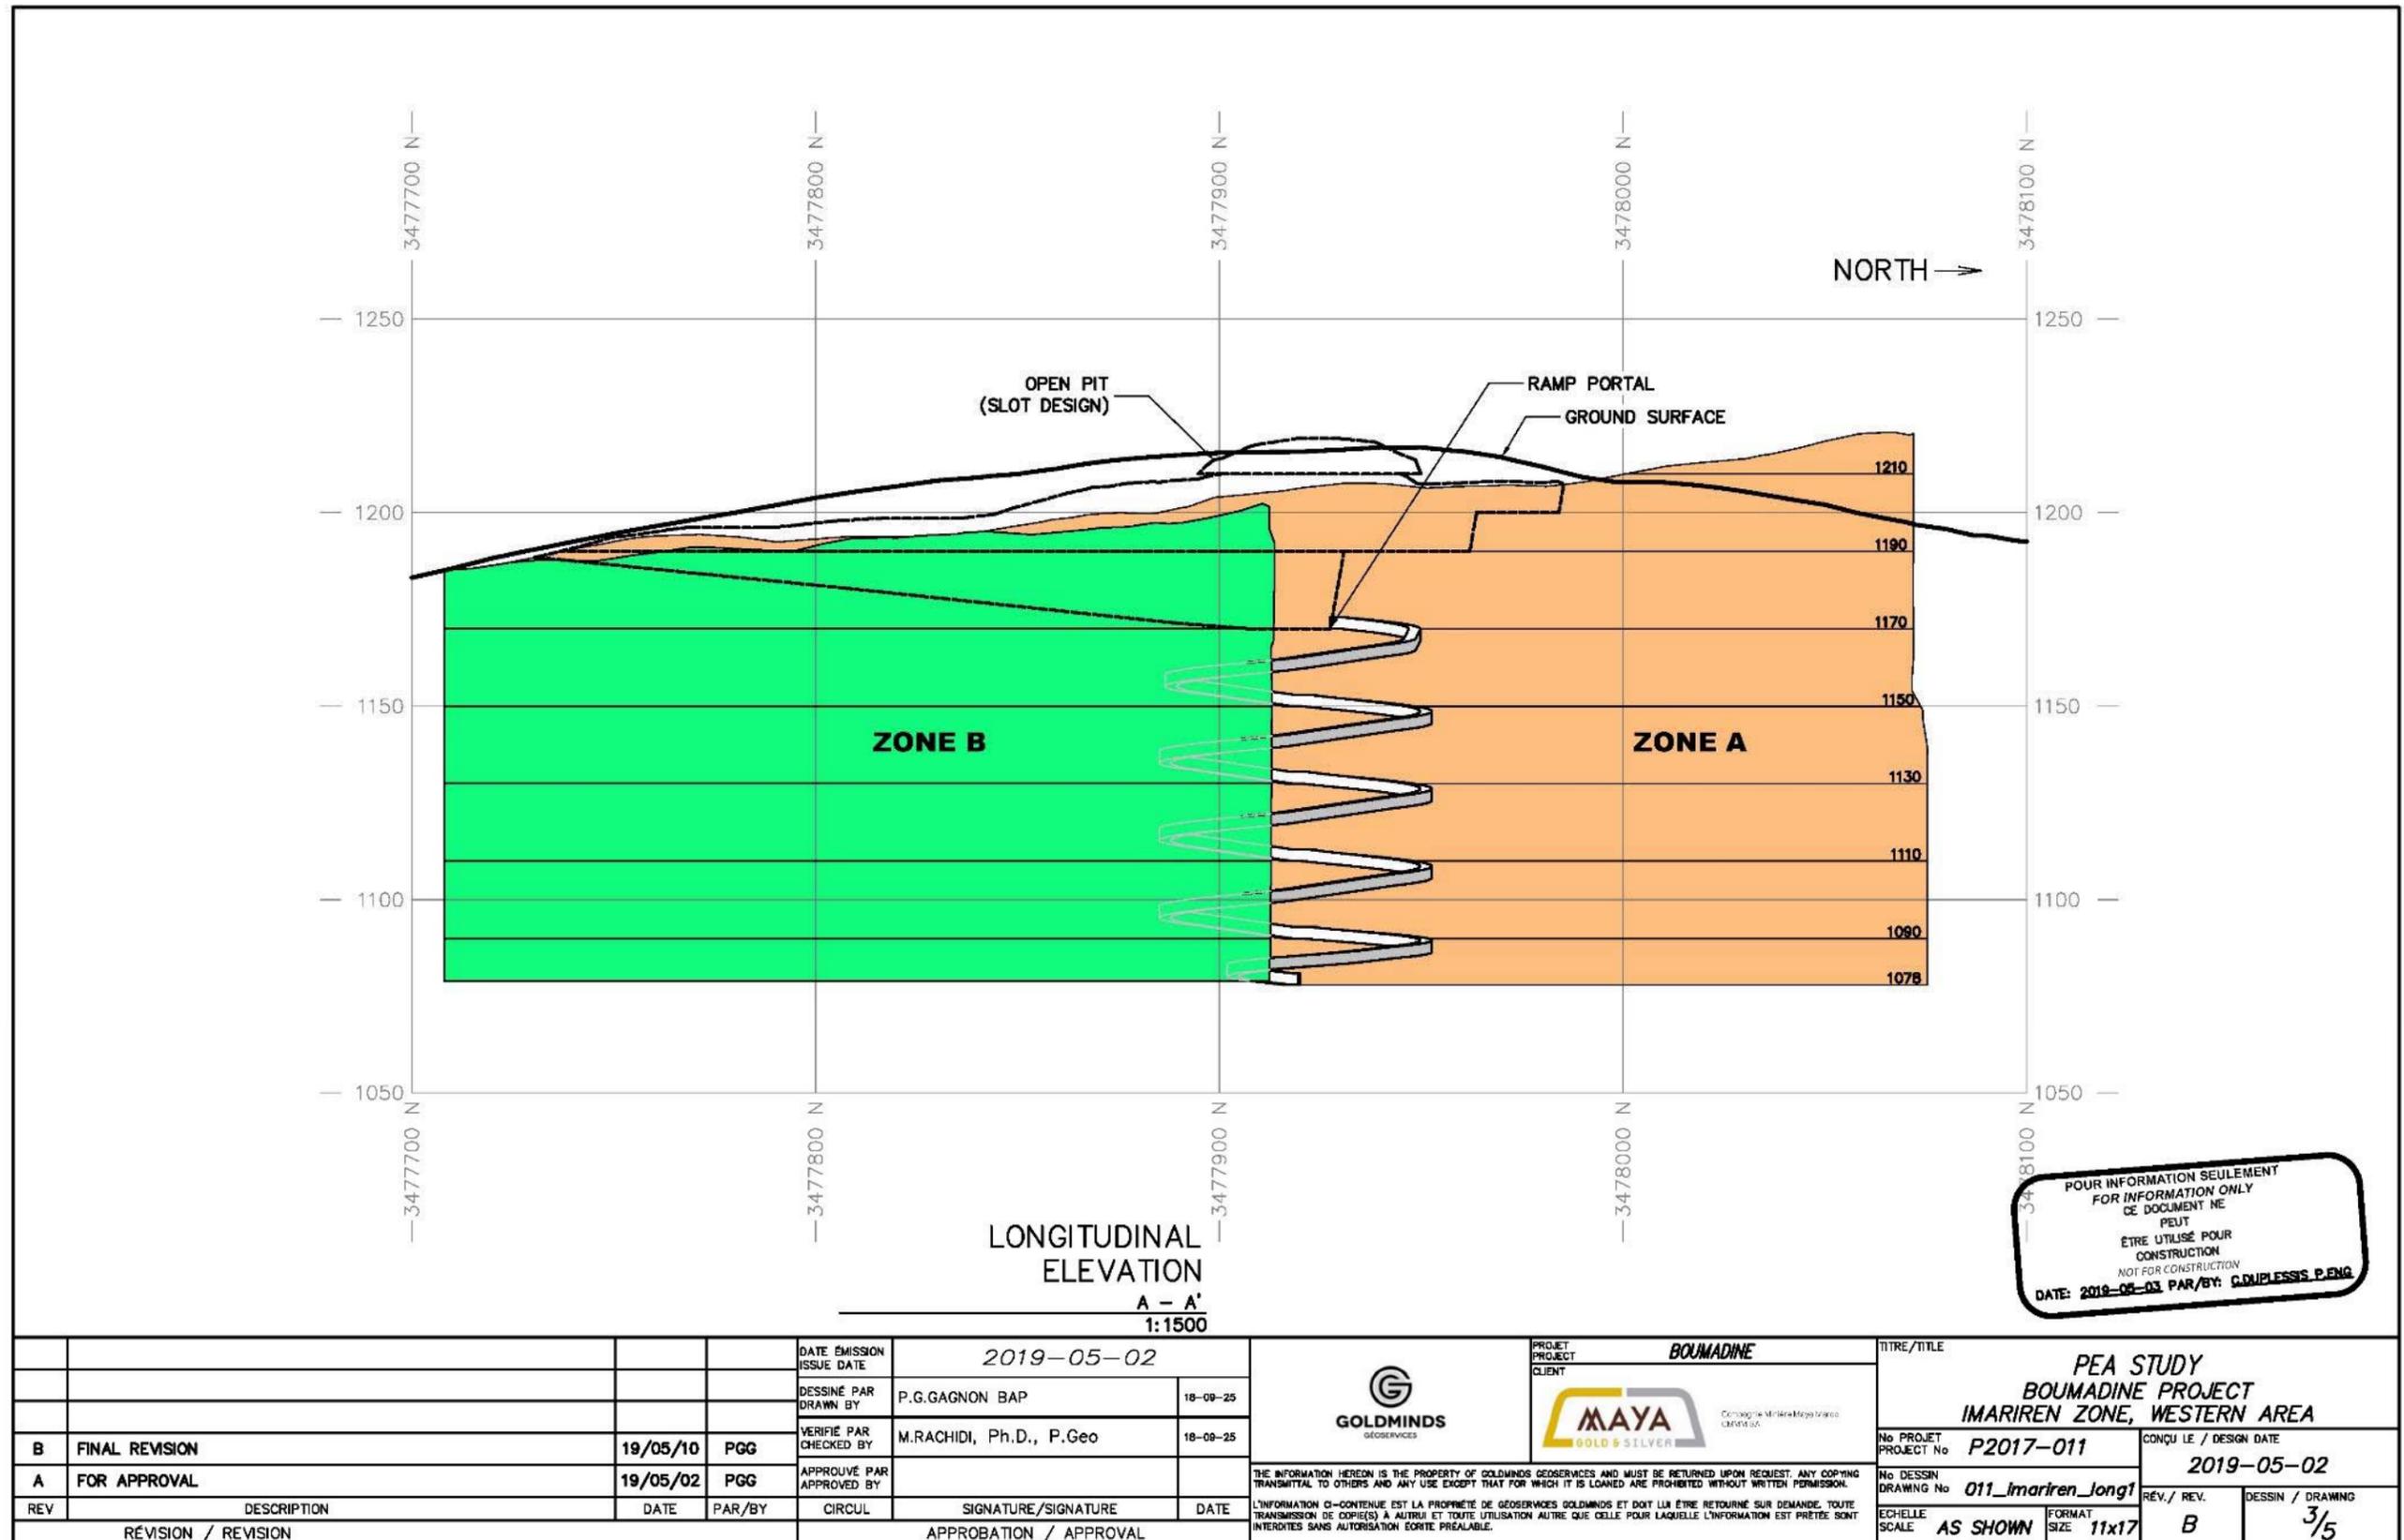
IMARIEN zone, western area, longitudinal elevation.
